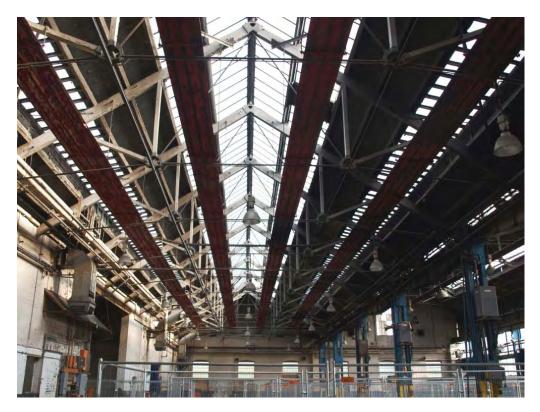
Composite roof truss on west side of Factory (former Lifting Shop) (15a)
